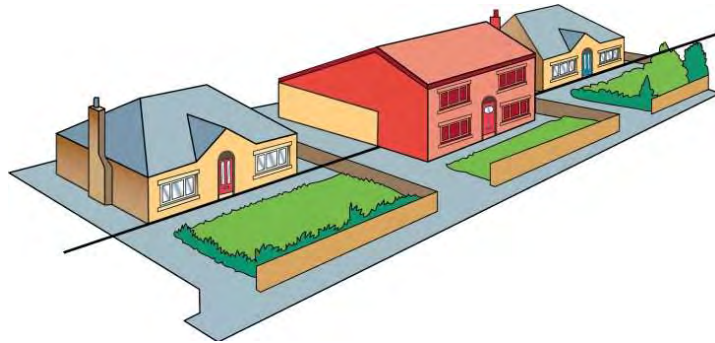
Example of how raising the eaves height of a bungalow has caused a shallower pitched roof from the neighbouring properties. This makes it incongruous with the rest of the street, over dominant in scale and out of step with the building line.
